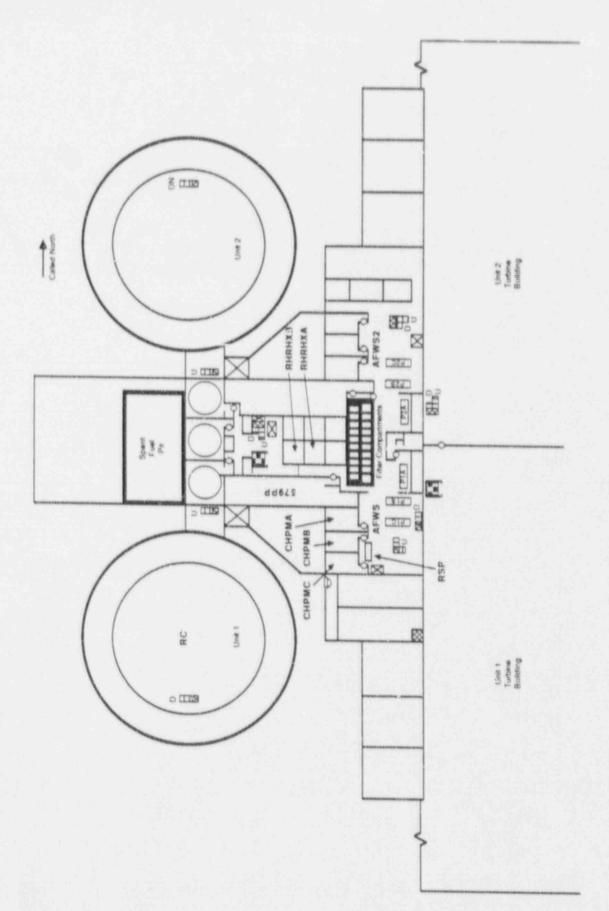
Zion 1 and 2 General Arrangement, Elevation 579"
